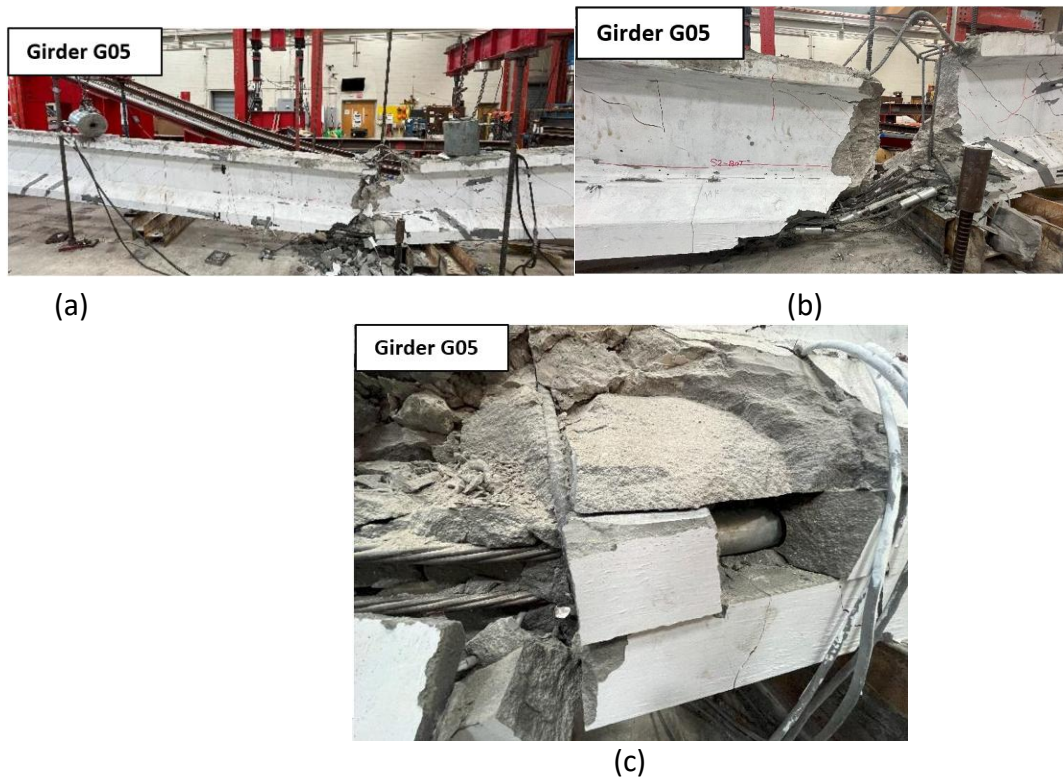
Girder G05 failure (a) Failure at the splicing location, (b) Close-up to the splicing after concrete removal, (c) Splice chuck causing a horizontal crack
